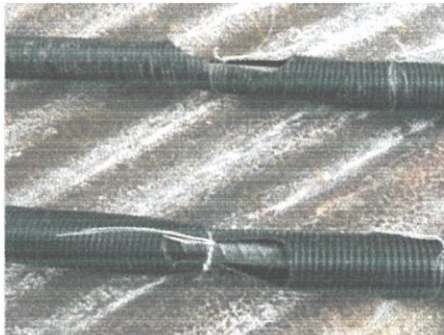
Centralisers located at the soil nail components. (Draw-off tower)
